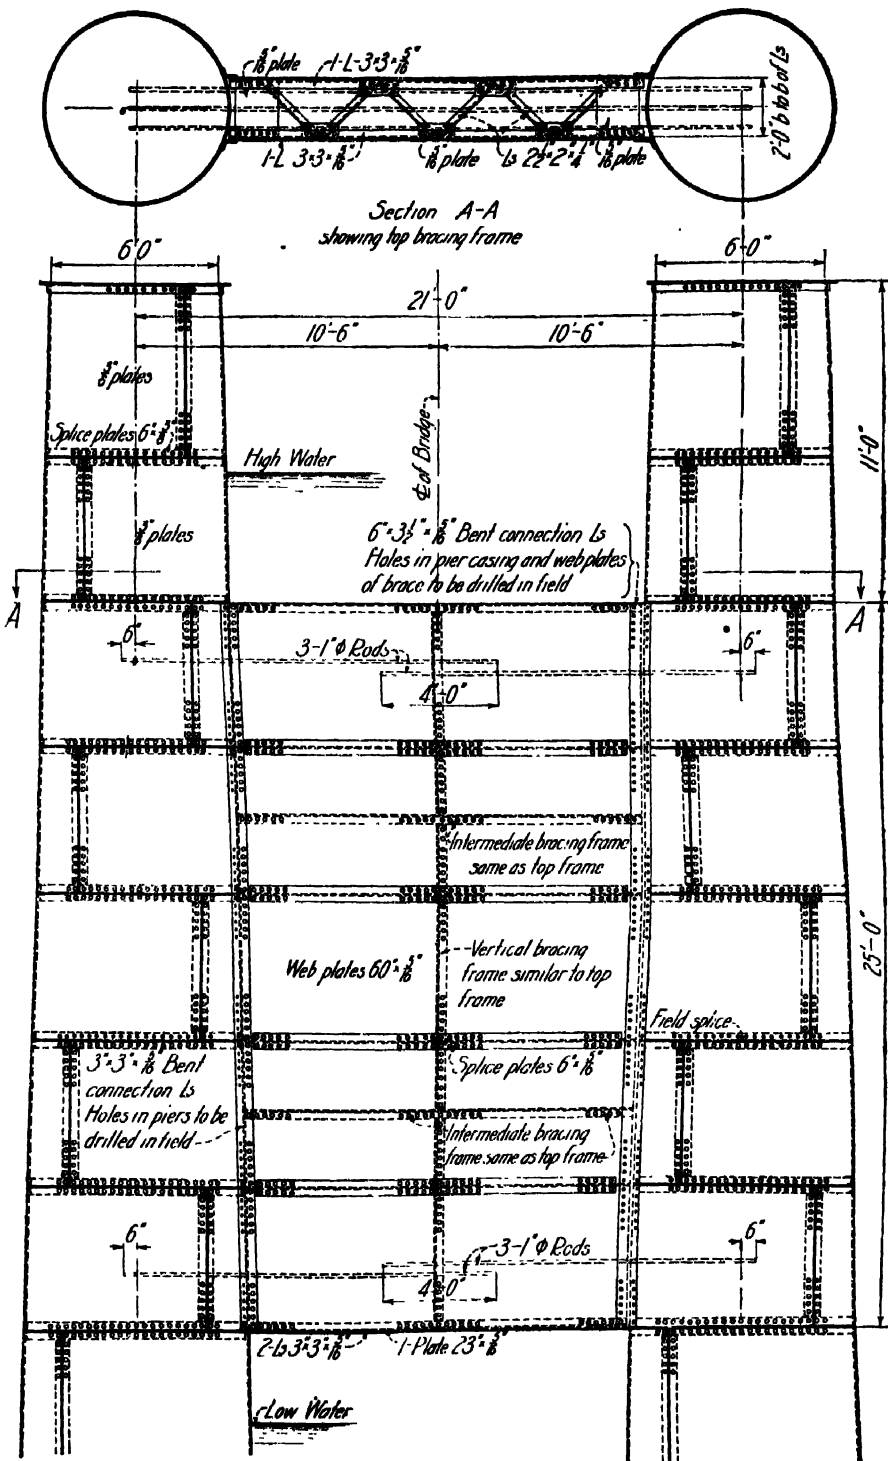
Details of Solid-web Bracing for Steel Cylinder Piers.
